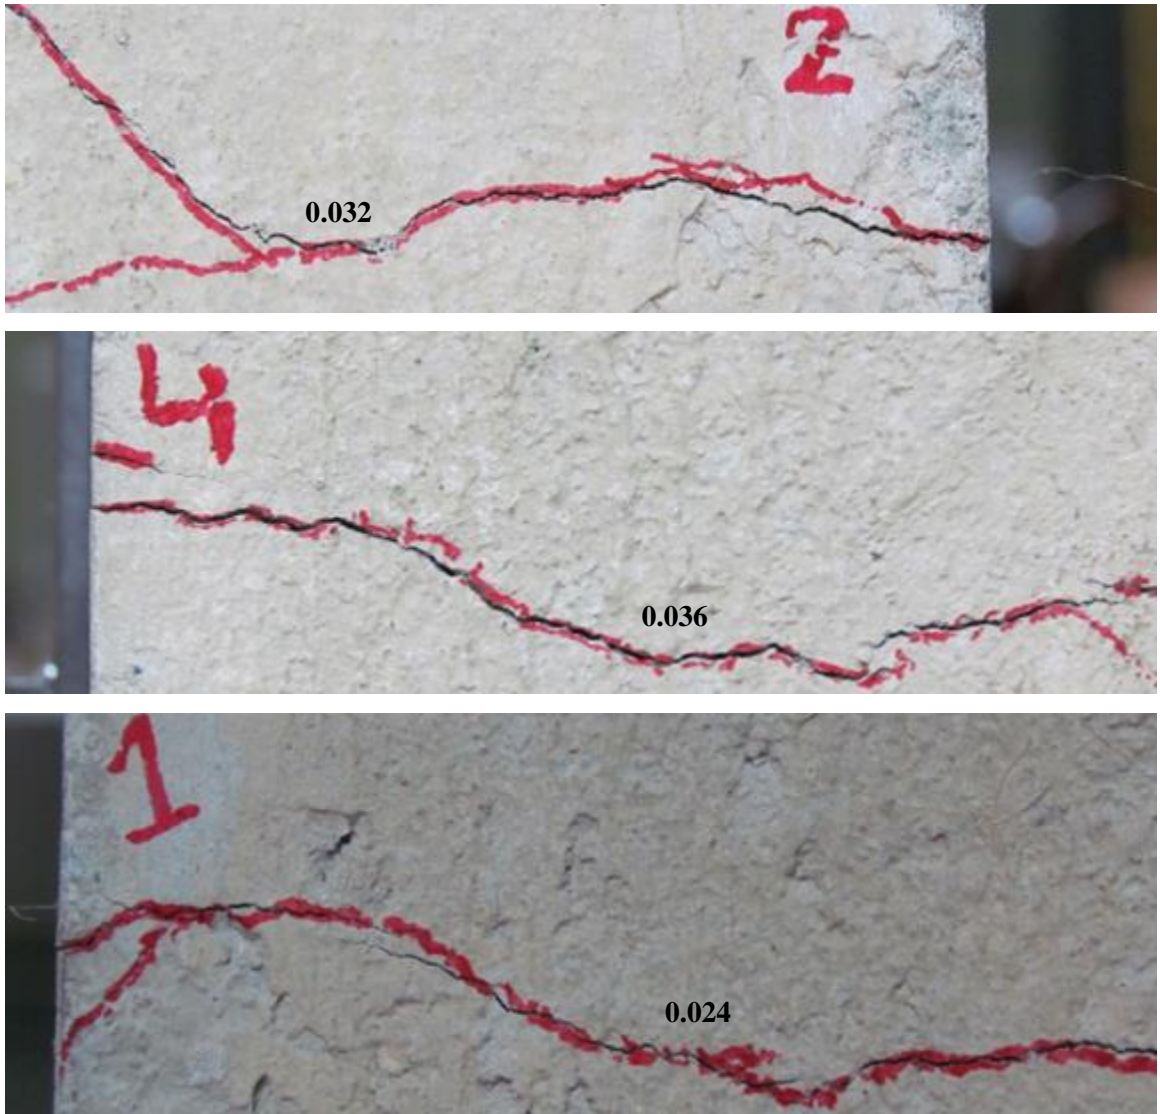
Cracks on west face of TS02 at Load Step 21
